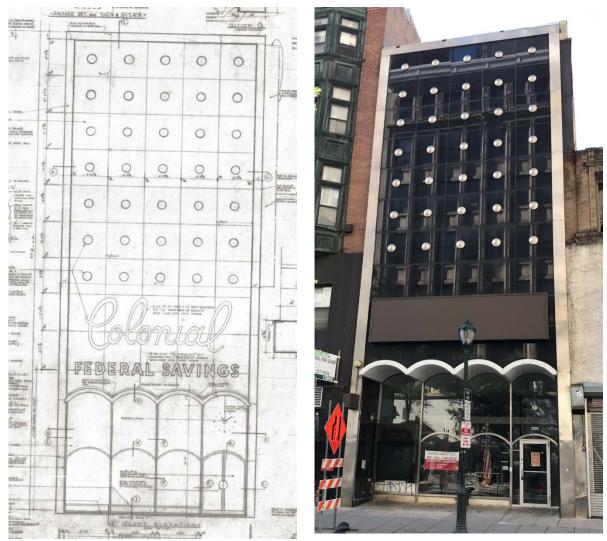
(left): Original façade drawing by architect Lee Casaccio, Alterations Colonial Federal Savings and Loan, Sheet 3 - Front Elevation and Details, 1962, courtesy of Lee Casaccio, Jr. Image 34 (right): Current image of 1206 Chestnut Street, September 2020
